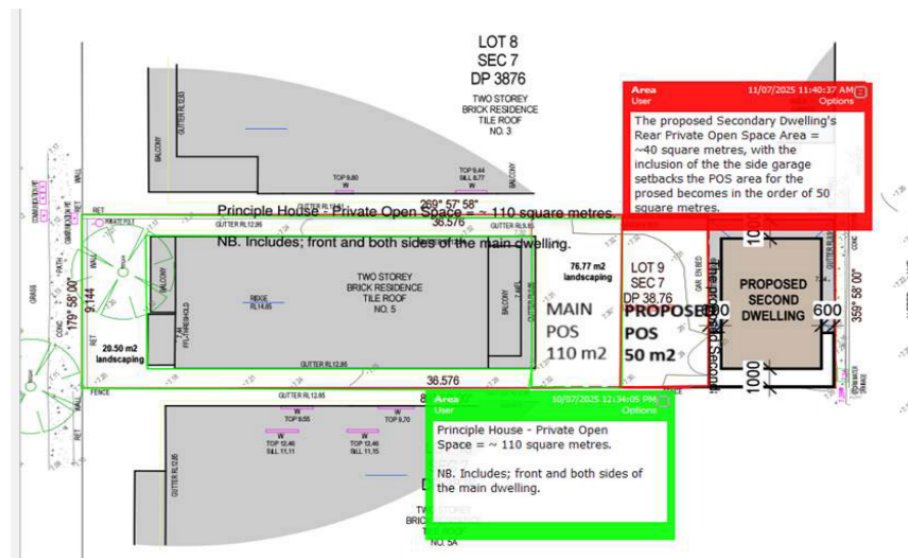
The layout provides clearly defined private open space areas for both the existing principal dwelling and the proposed secondary dwelling, in accordance with the Bayside DCP 2022 requirements.
